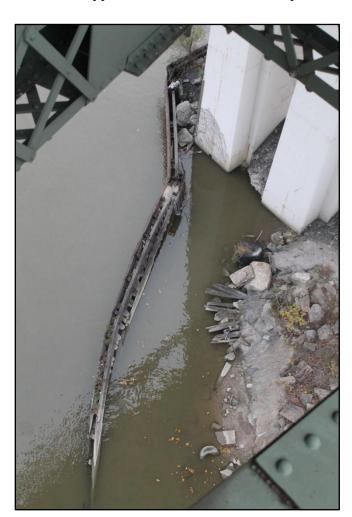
Failing Bulkhead along Pier 9 & East River Bank.
